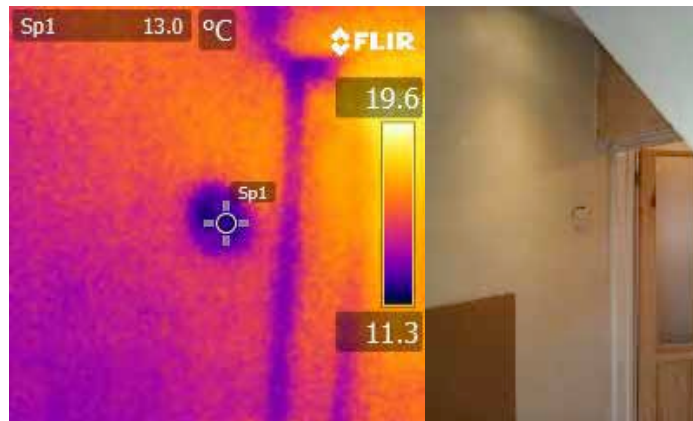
116 Abbeyforegate, Shrewsbury – ground floor living room, west wall.
